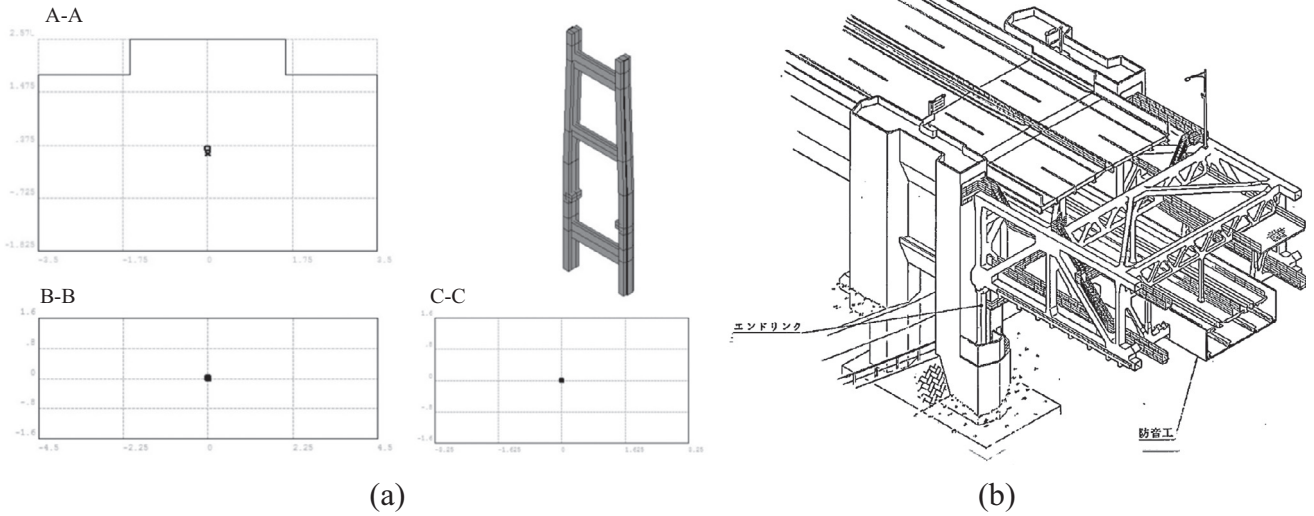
(a) Cross section of the towers, Section A-A is for the towers' legs (bounding rectangle 7 m × 4.4 m), section B-B (bounding rectangle 9 m × 3.2 m) if for the coupling beam at height 23 m and section C-C (bounding rectangle 6.5 m × 3.2 m) for the coupling beam at height 84 m. (b) General overview of the deck bridge end-links (Courtesy of Mr. M. Nishitani HBSE-JP).
